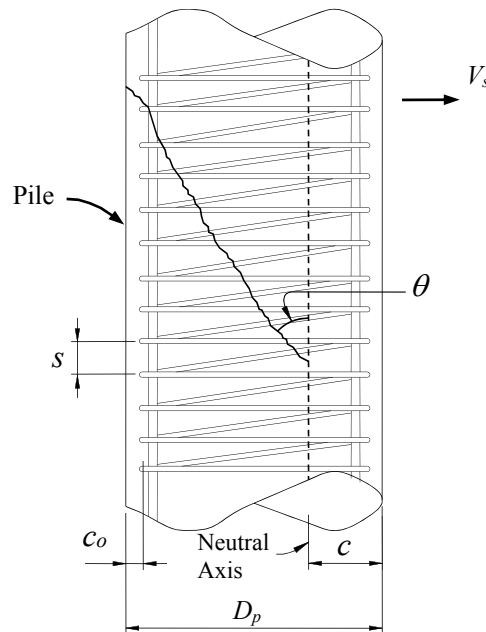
Transverse Shear Reinforcement Shear Strength Components
